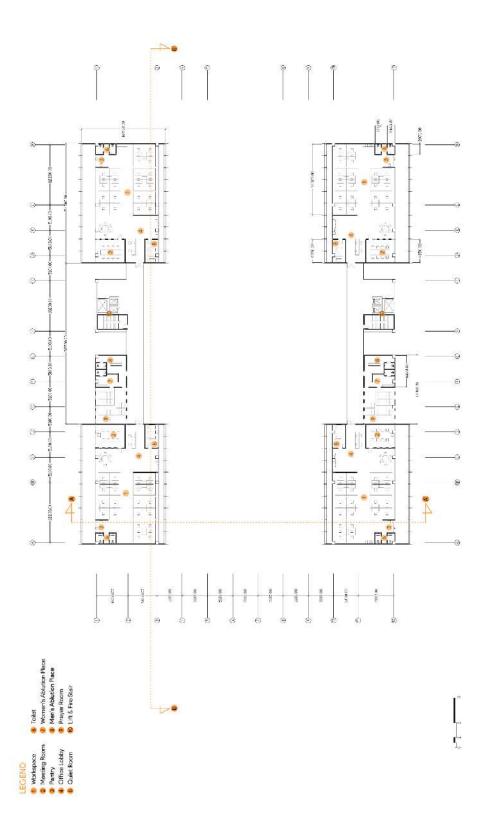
7th Floor Plan (Source: Personal Illustration)
